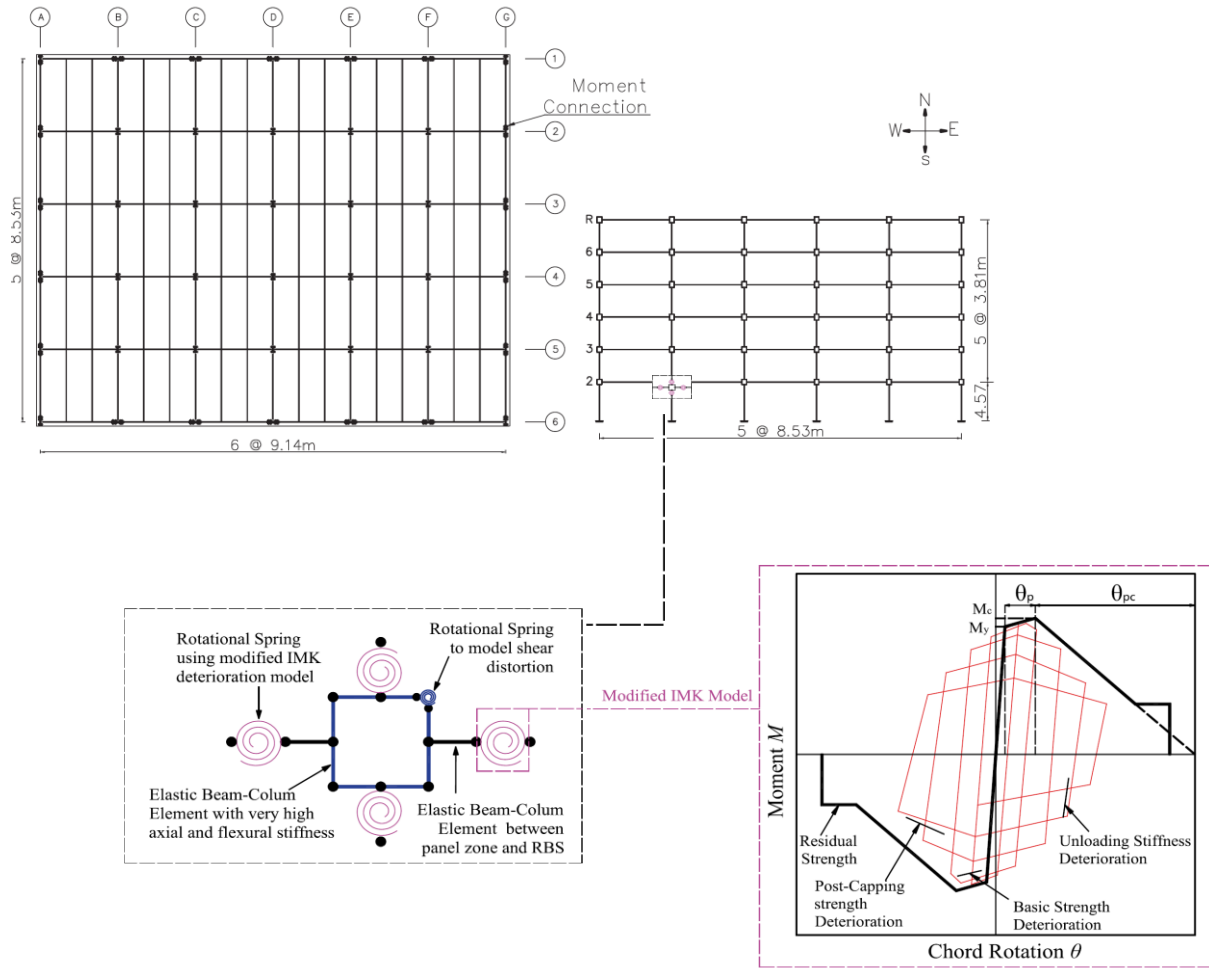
Six-story steel special moment resisting frame: (a) Plan (b) elevation of nine-story steel special moment resisting frame (c) modeling details.
